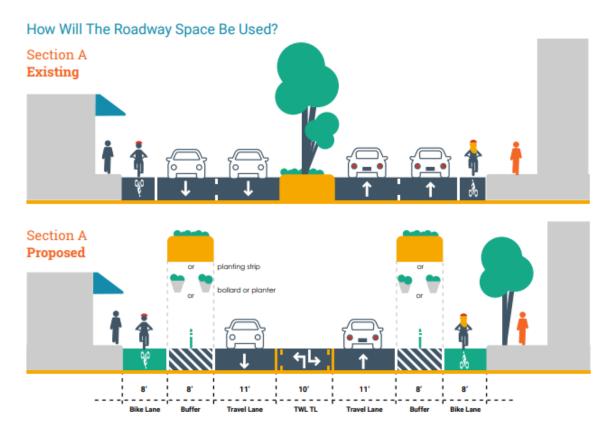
Marysville Boulevard Existing and Proposed Cross Sections
